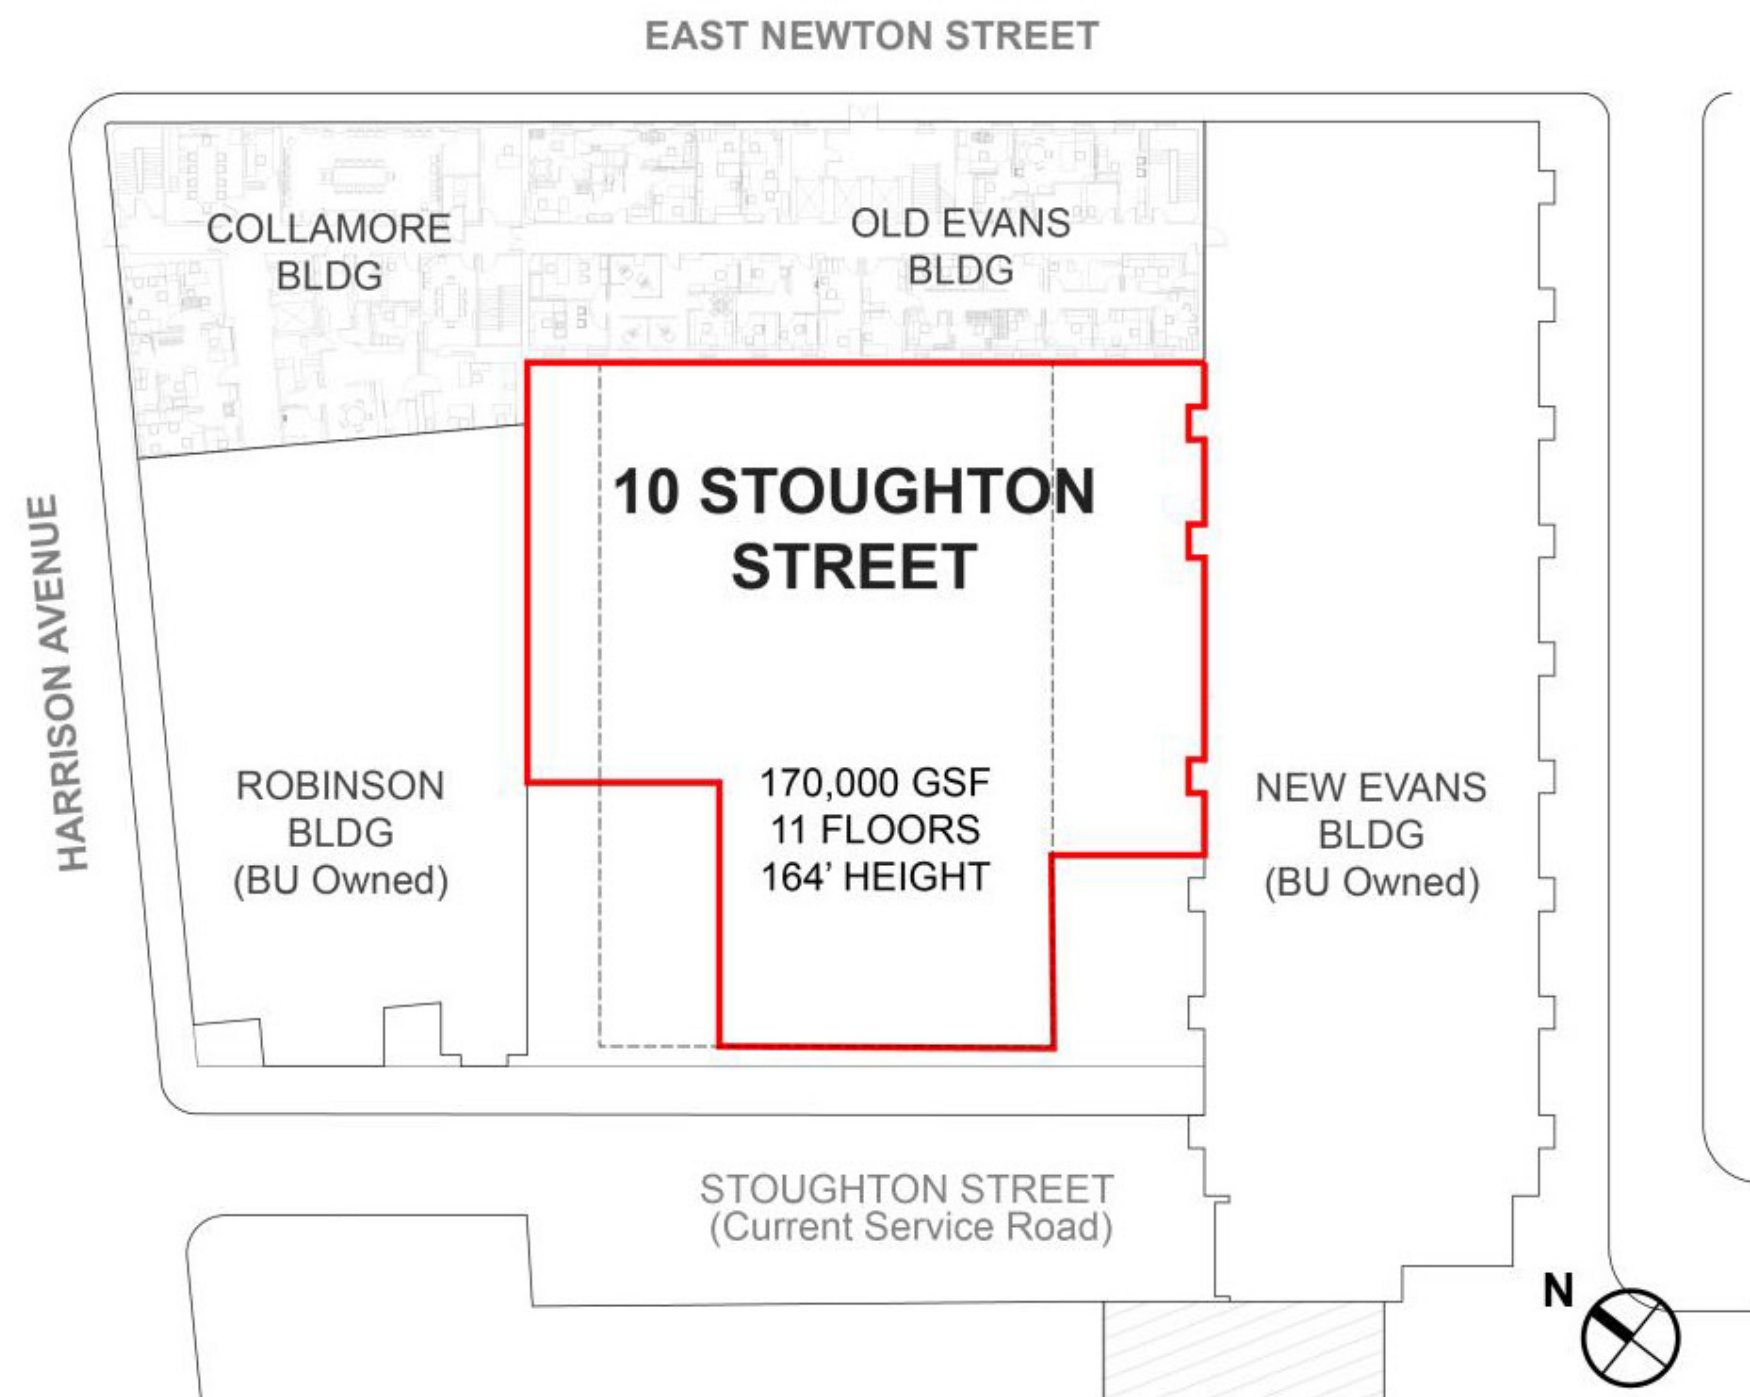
10 Stoughton Street & Collamore/Old Evans Ground Floor Plan
